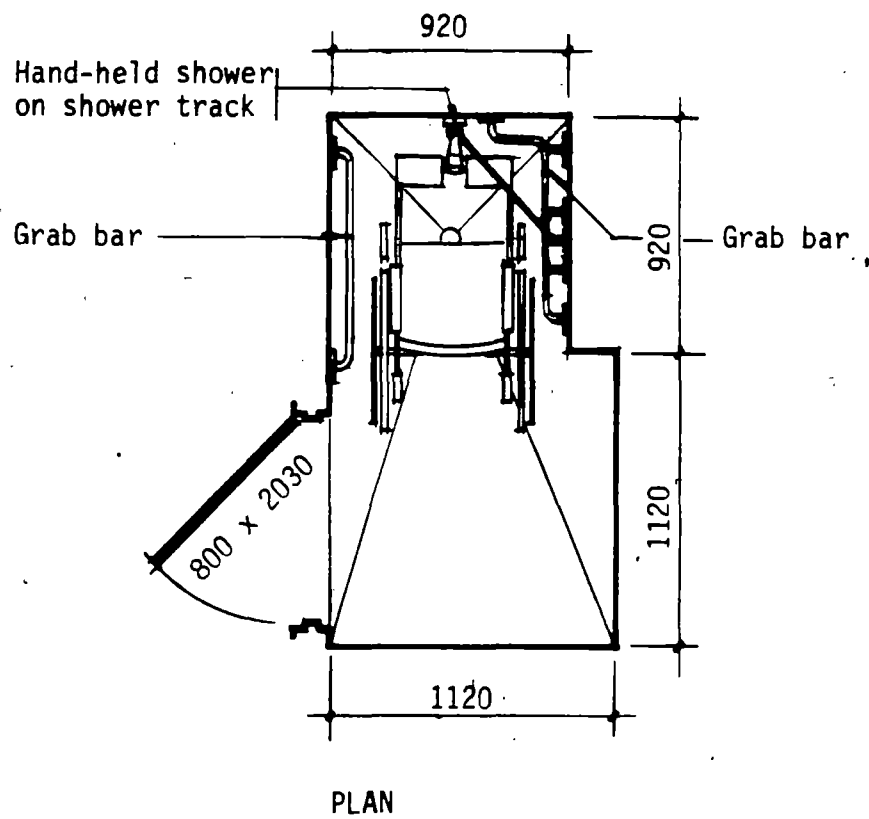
DETAIL OF TYPICAL FOUR PIECE BATHROOM⁸ DESIGN DETAIL NO.2.
